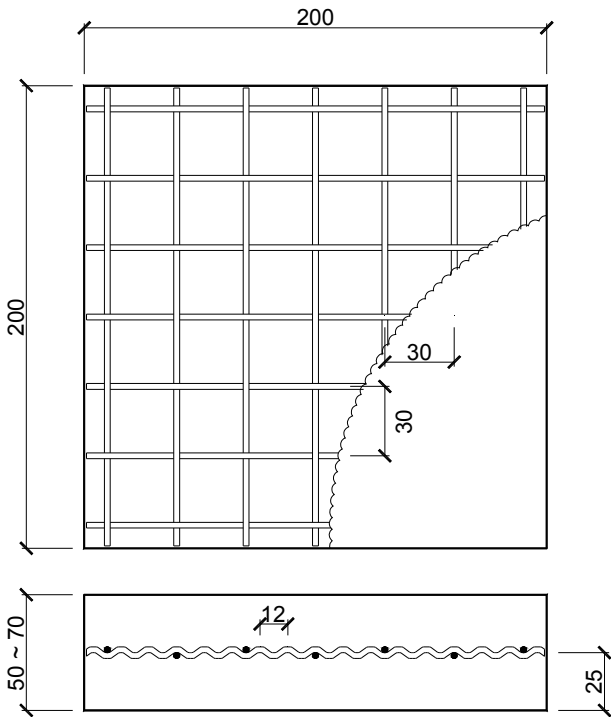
Dimension of specimen and lay-out of the crimped wire mesh (mm)
